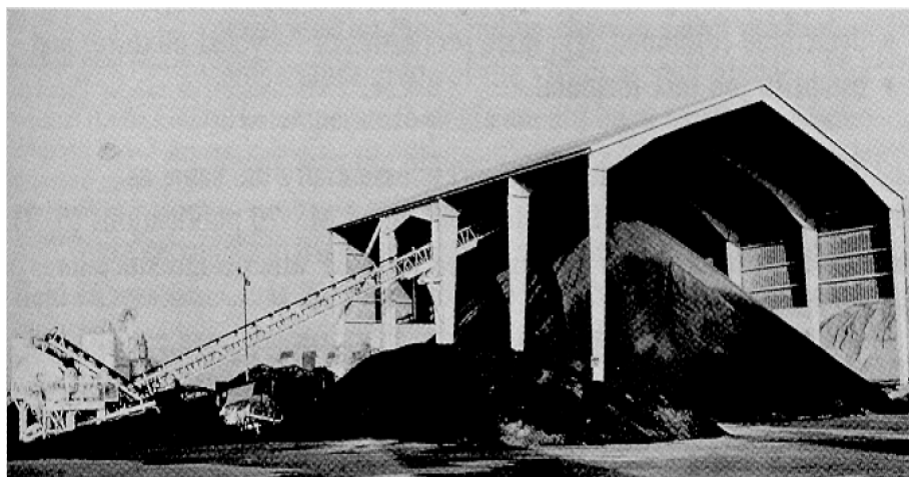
Storing RAP under a Covered Roof (NAPA 2007).
